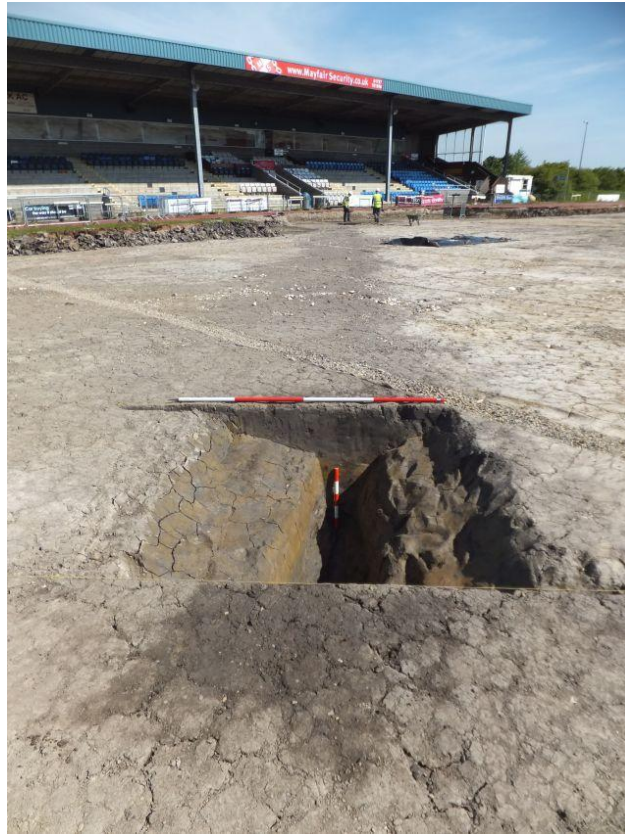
Context 1087 north-west facing section. Larger scale unit 0.5m
